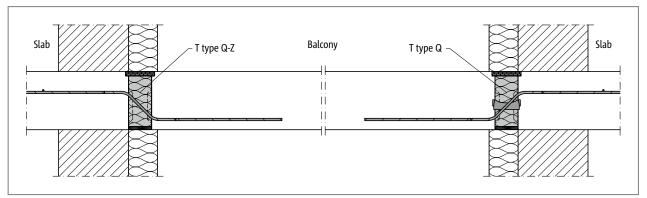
Schöck Isokorb® T type Q-Z, Q: Application case one-way reinforced concrete slab
